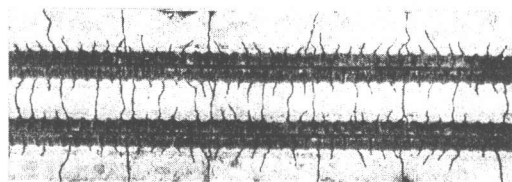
Pattern of internal cracks between two bars placed at close spacing
